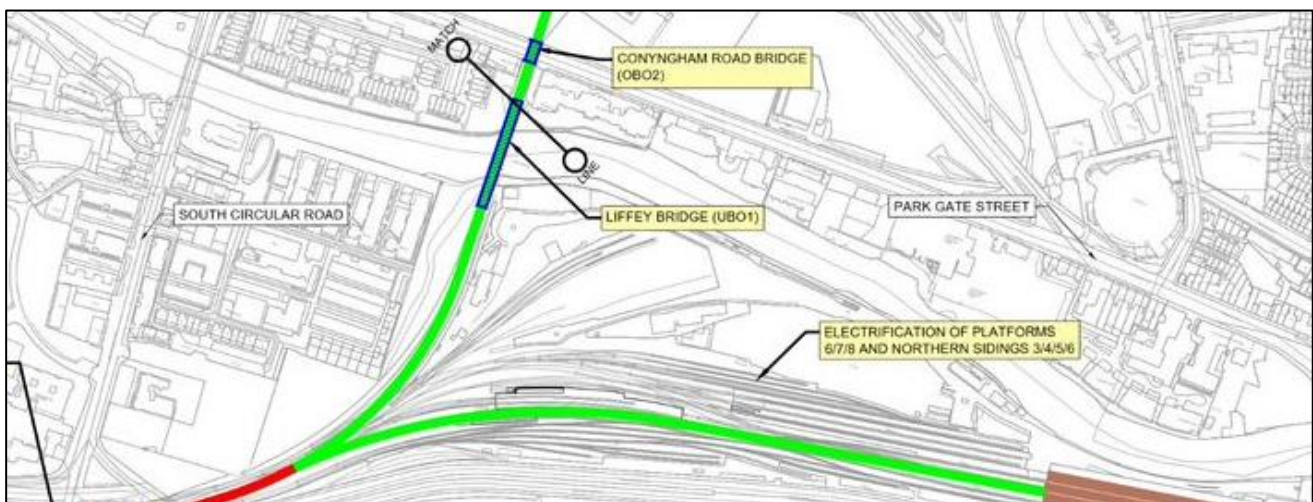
Emerging Preferred Option East for Liffey Bridge and Conyngham Road Bridge (OBO2)
